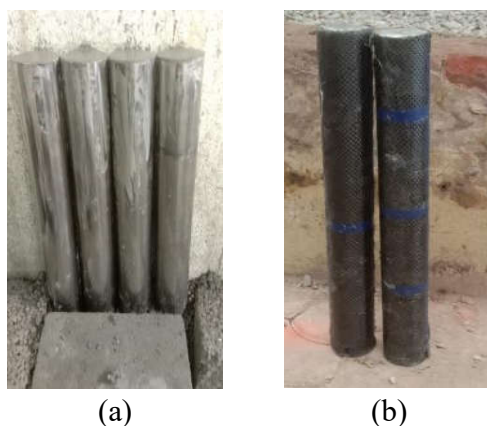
Preparation of Specimens: (a) casting of column specimen and (b) specimen wrapped with CFRP
